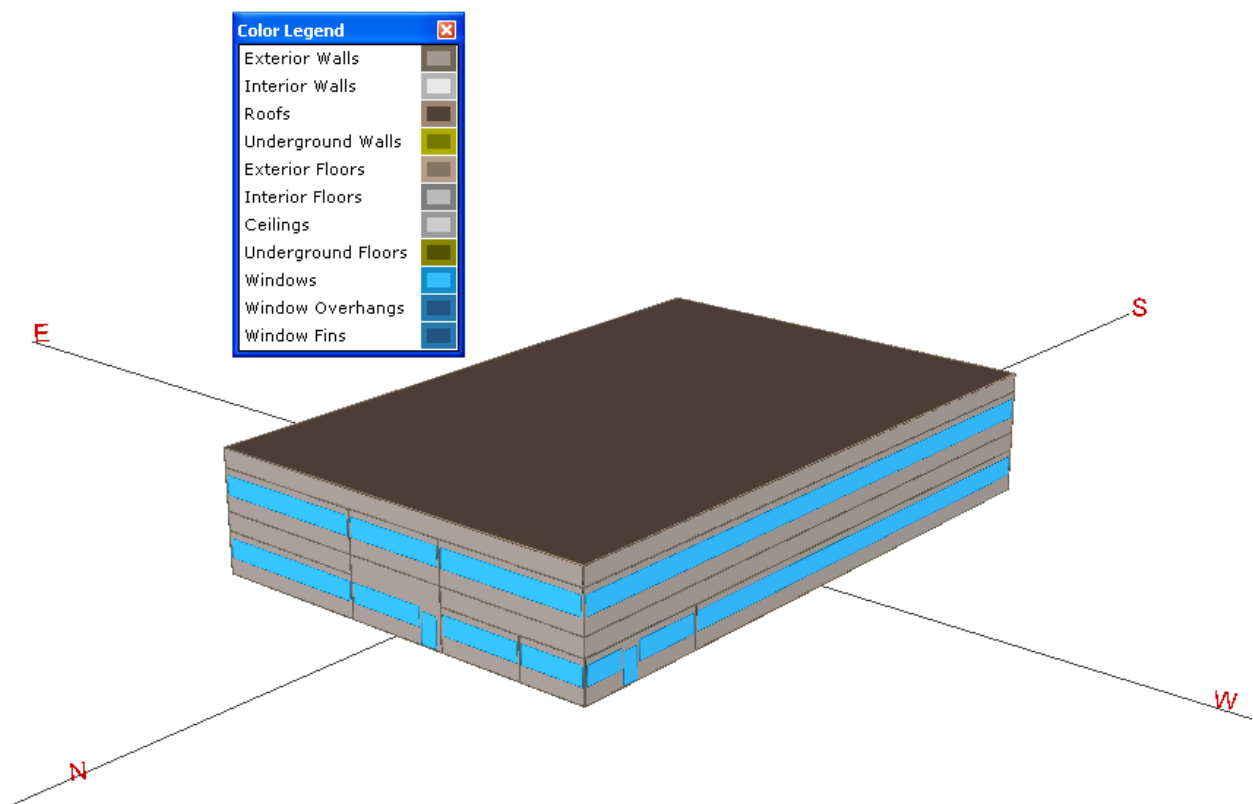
3-D rendering of building, northwestern perspective (Case Study I).
